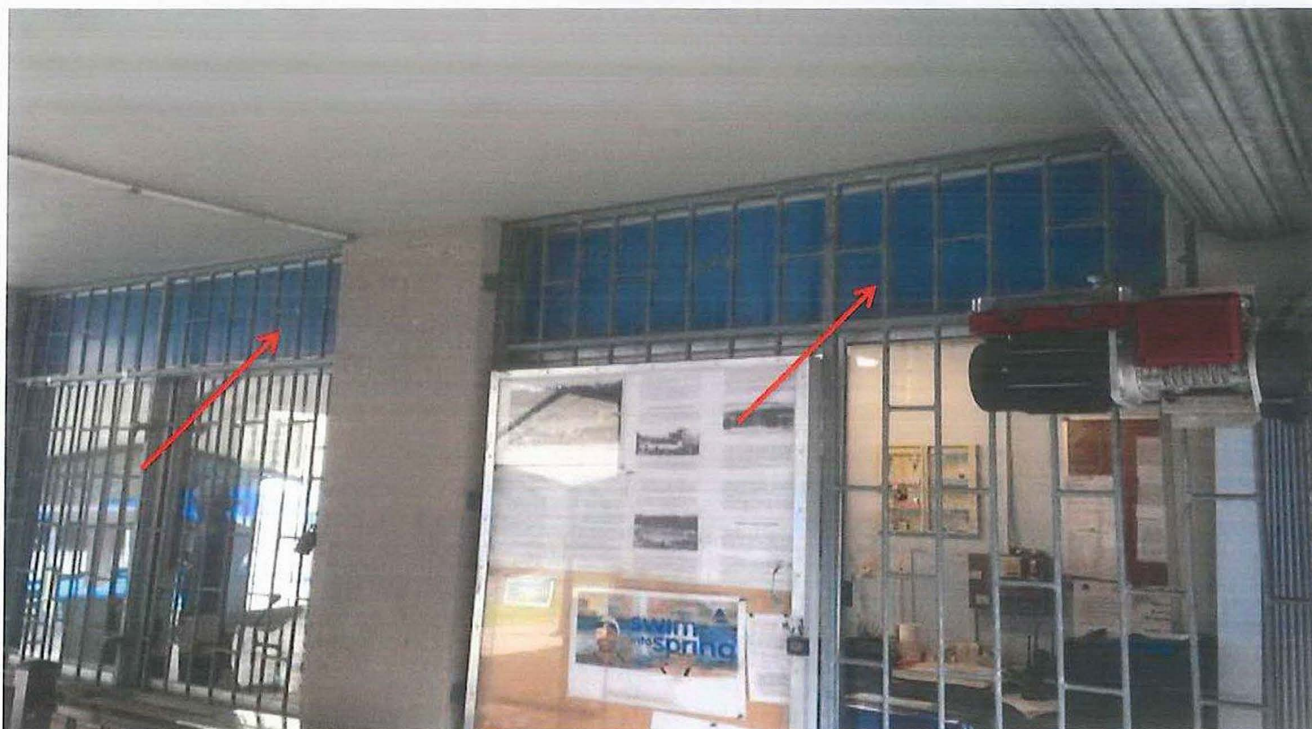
Asset D00097 – Lawson Pool – Canteen and Office – Entrance Area – asbestos cement sheet infill panel above gates.
